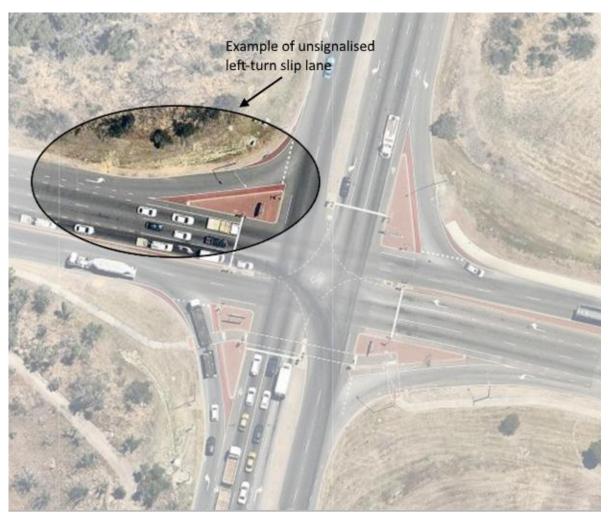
Existing Form of Welshpool Road East / Hale Road Intersection
